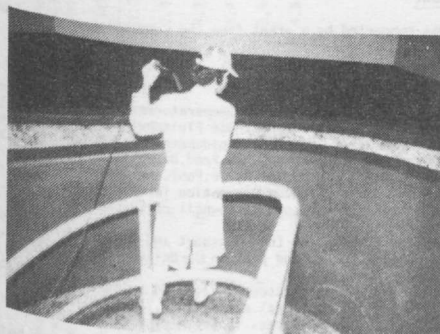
Handler working the inside radius. He is in position 2 on Figure 1.
